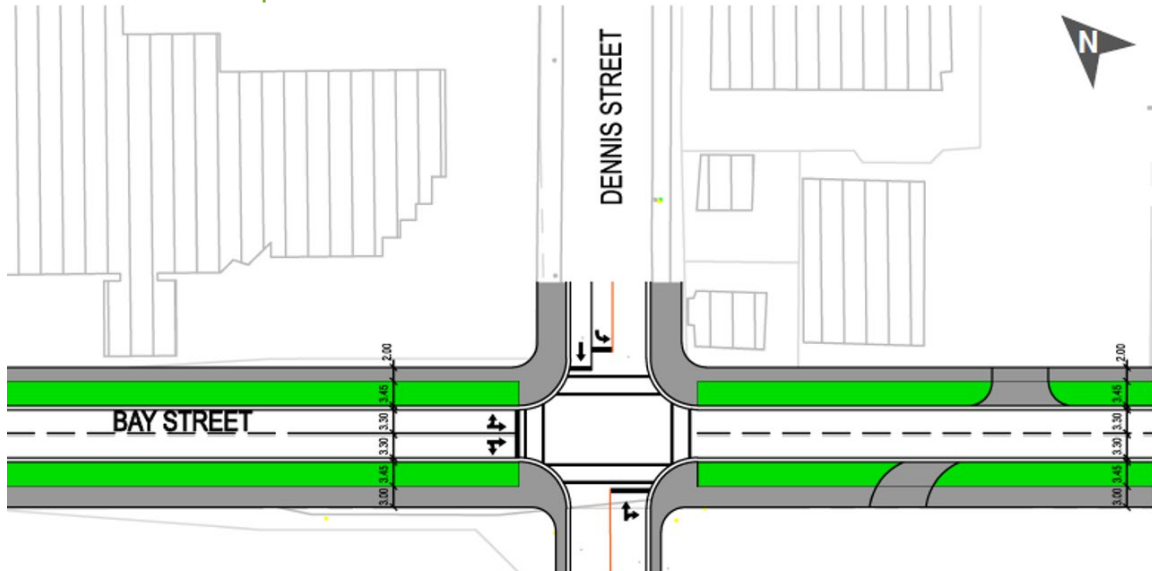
and Exhibit 4.4 illustrate the typical cross-sections and plan view for Alternative 1A.
